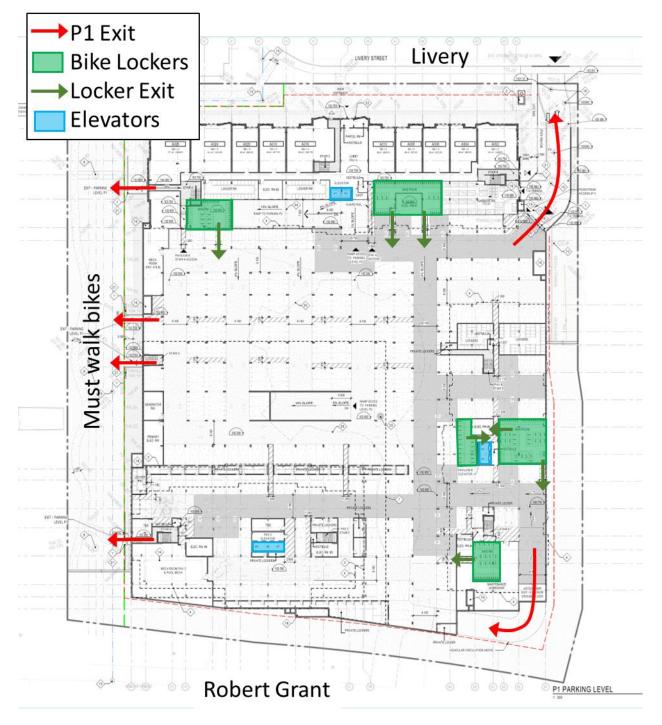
Location of Bike Parking and Access to Adjacent Facilities
